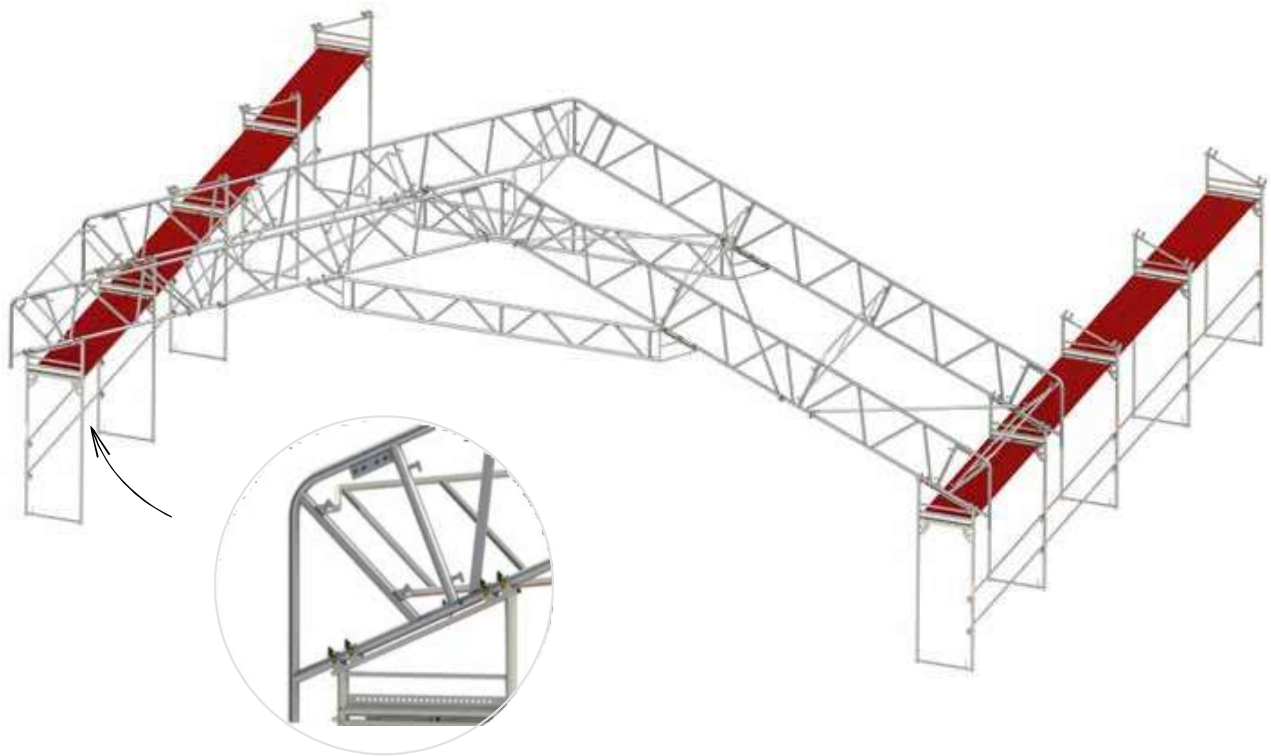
Installation of handrails in the first base bay of the roof slope.
